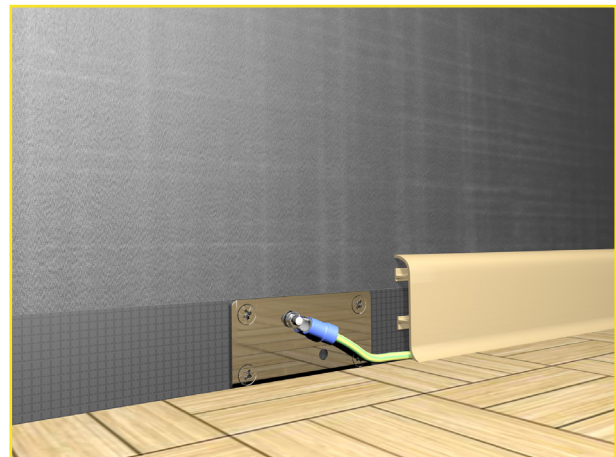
Fastening the Grounding plate EGP and connecting the grounding wire
